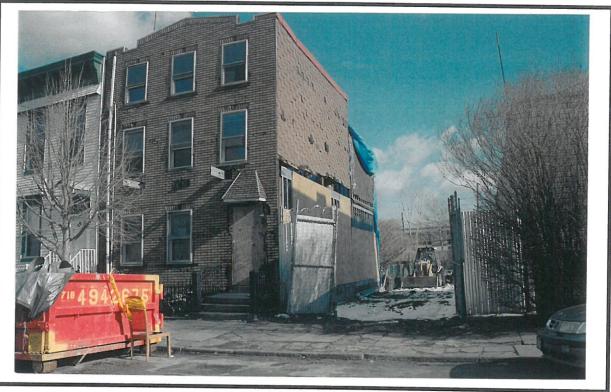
House located west of Lot 43 is reported to date from late 19th century, after installation of sewer and water on Dikeman Street. View to northwest.
